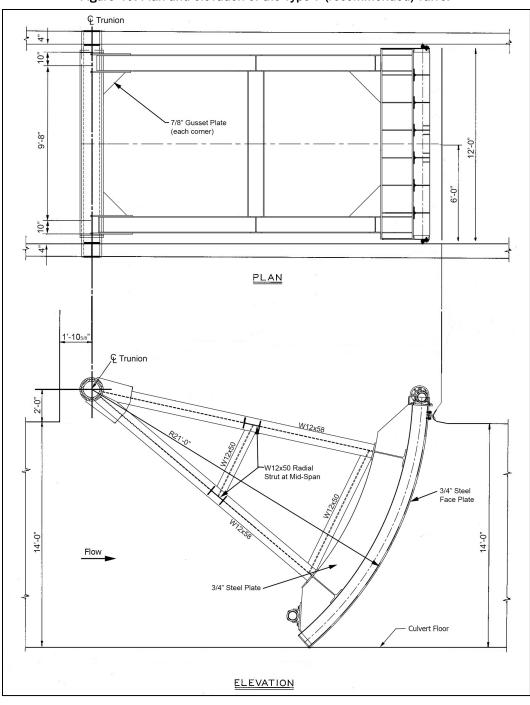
Plan and elevation of the Type 7 (recommended) valve.
